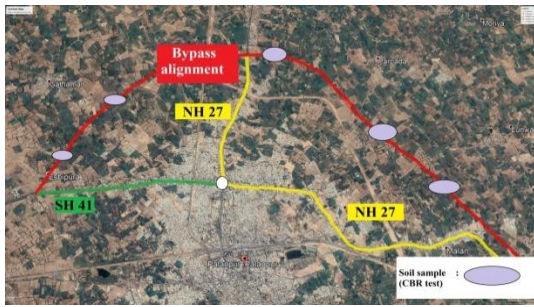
soil sample collection for CBR test on proposed bypass alignment
